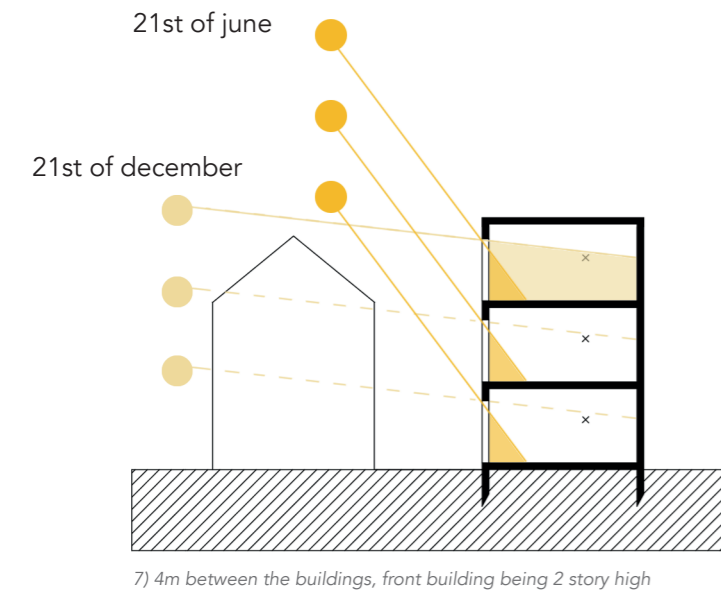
shows that with a 2 story building facing our building and 4m between them, every apartment will get direct sunlight in the summer, but only the top story apartment will also get direct sunlight in winter (which means all year long). Figure 3 and 4 (representing the same scenarios but with a space of 5m and 6m between the buildings) gives the same results.
